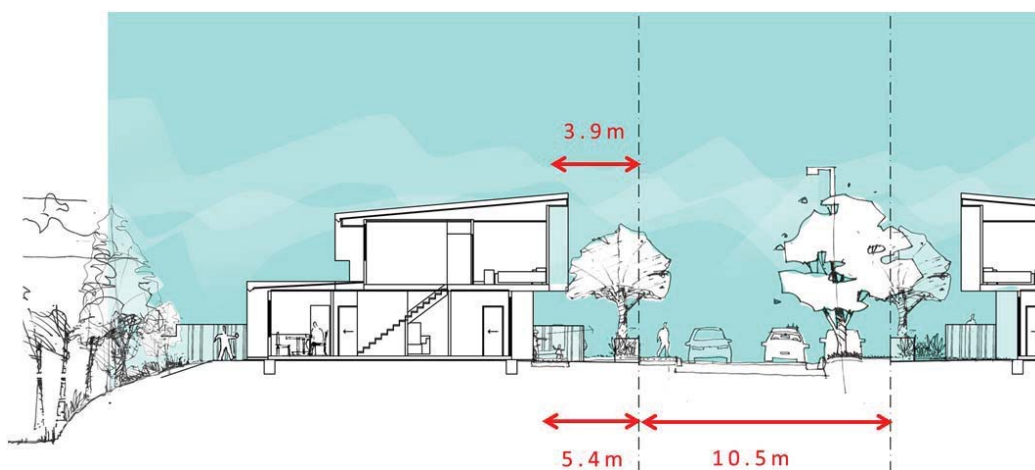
Indicative Interface Lot E Townhouses with Fourth Avenue and Lot D Townhouses
